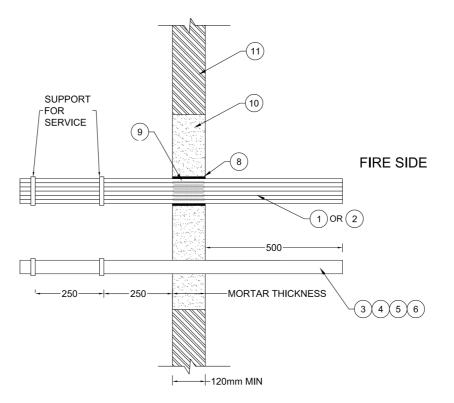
Typical Details for Cables and Metal Pipes penetrating 3M Firedam Mortar in Walls
